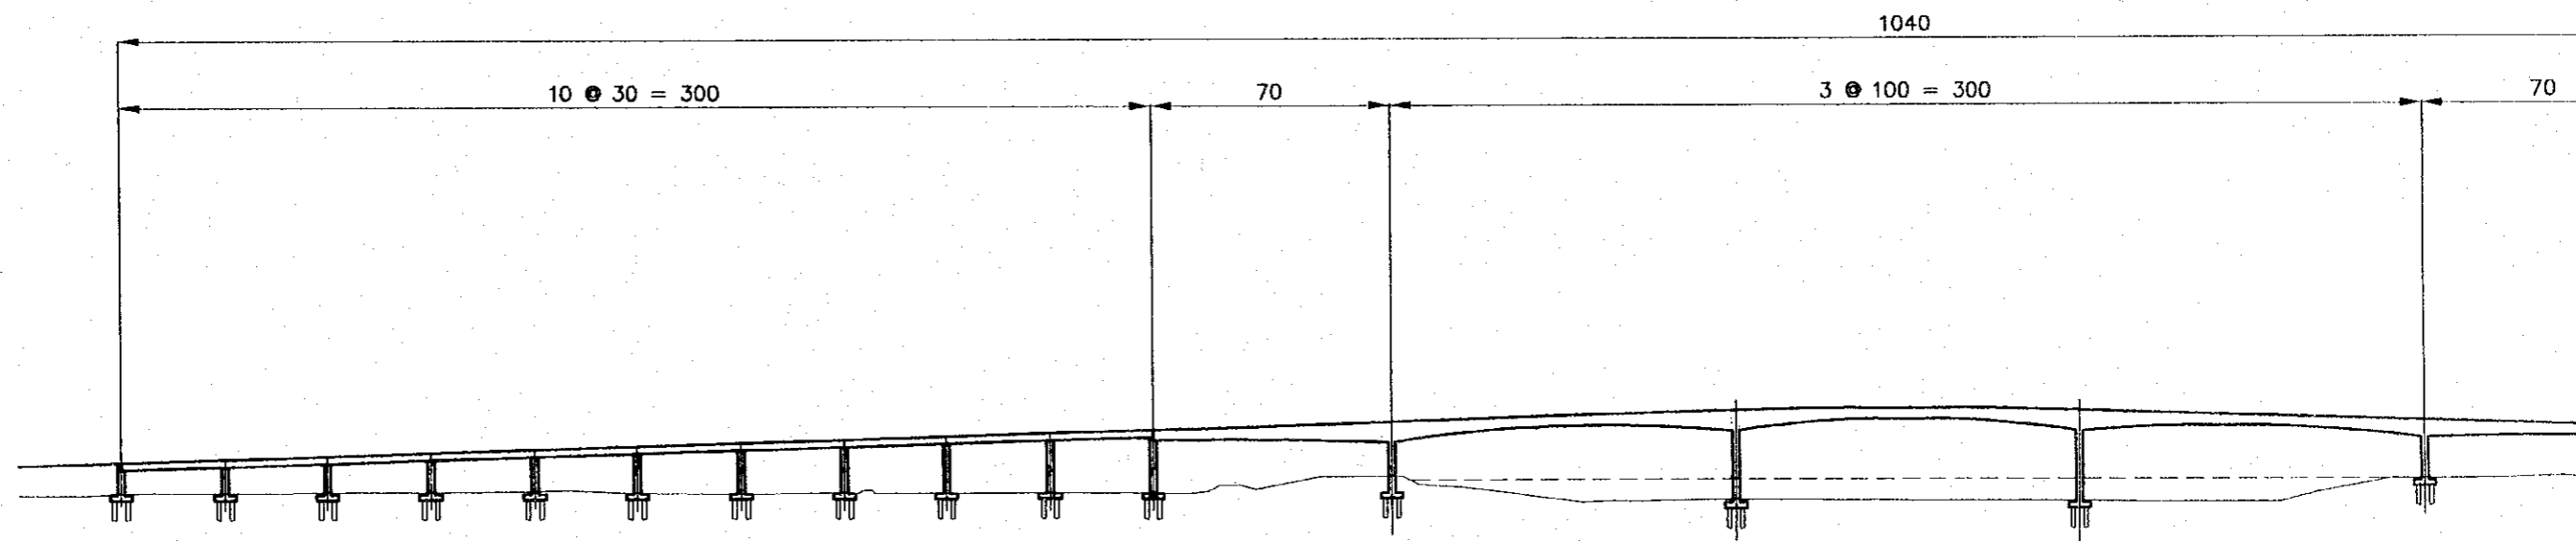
Recommended Type for Rupsa Bridge
